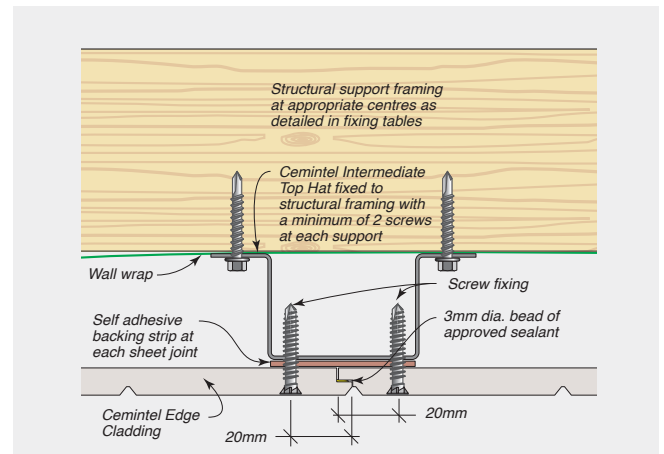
Vertical Joint – Cladding Fixed to Structural Top Hat Off Stud – Edge V-Groove
